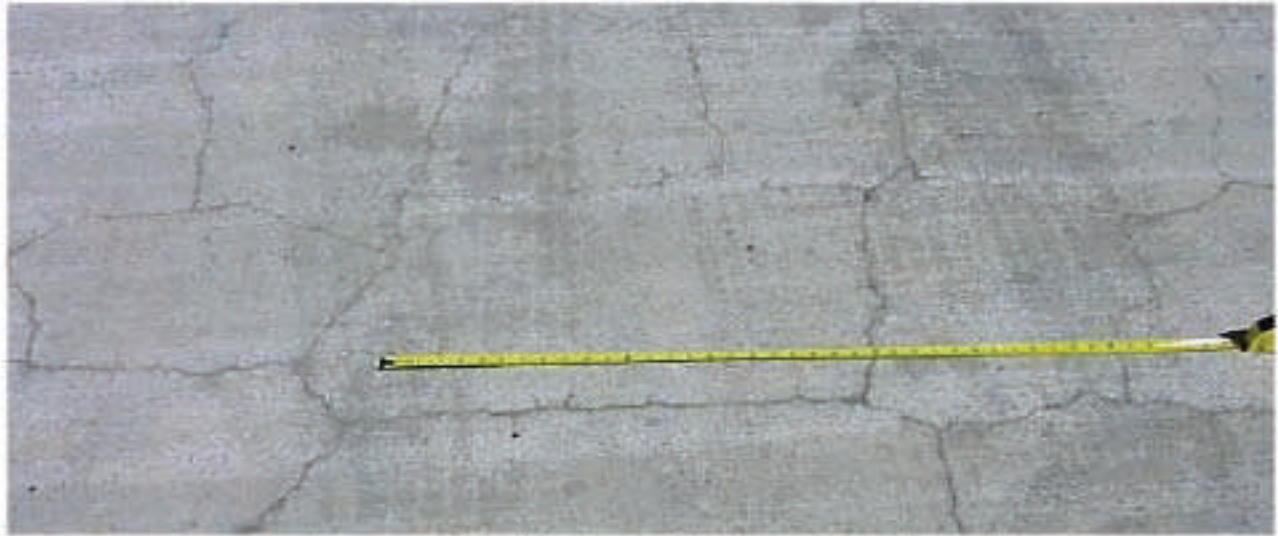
Typical Widespread Cracking Pattern on a Bridge Deck
